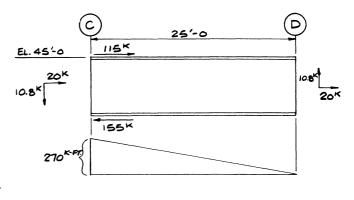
Beam subjected to eccentric bracing loads (arrangement of Fig. 4b)
